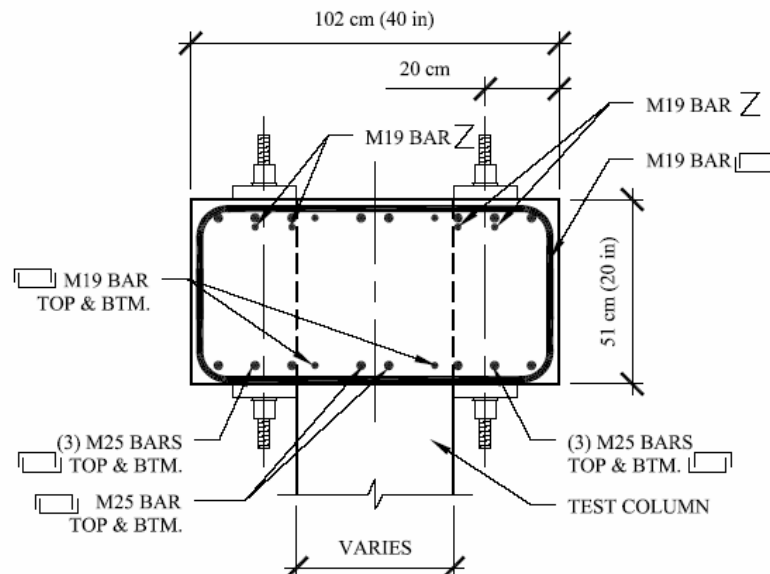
Schematic of Transverse Section of Shear Column Load Stub
